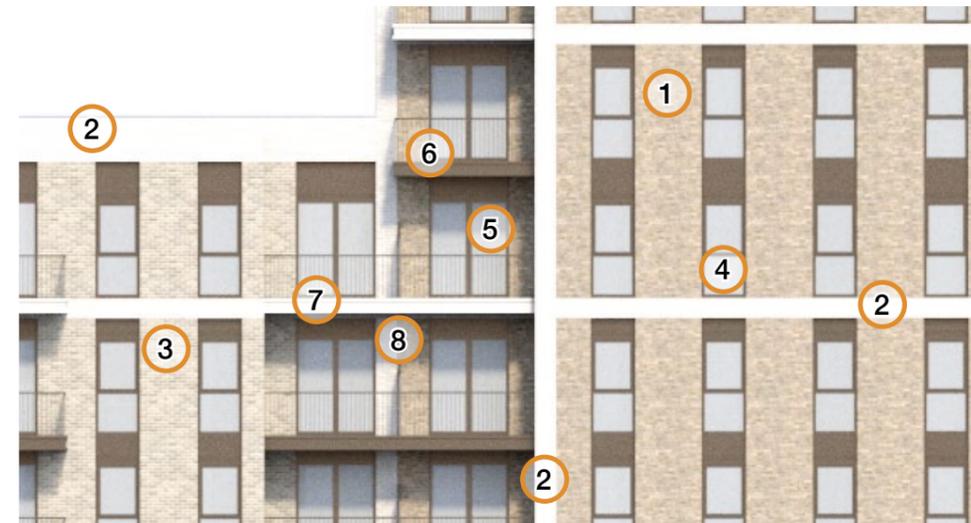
Building B2B3 - Bay elevation at intermediate level
